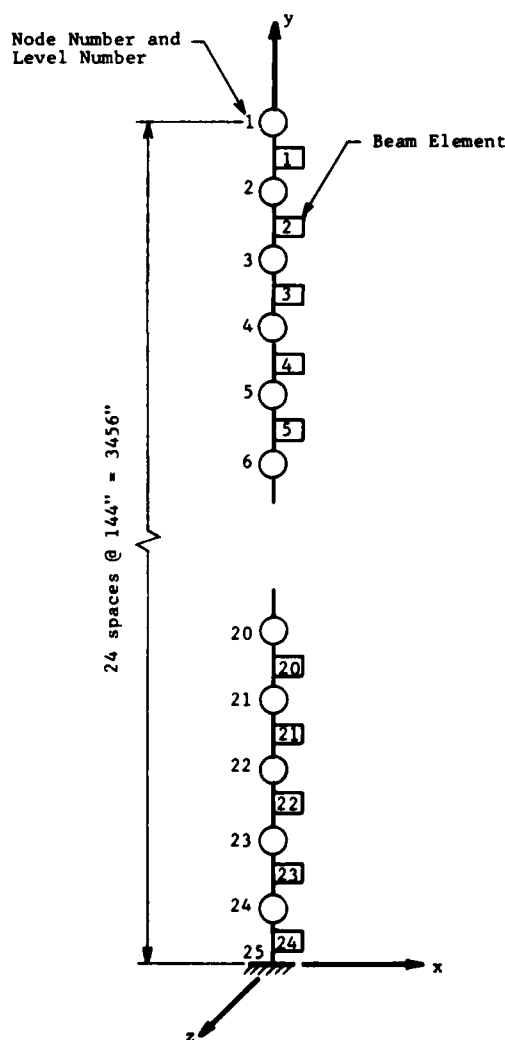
FINITE ELEMENT MODEL OF 24-STORY BUILDING
